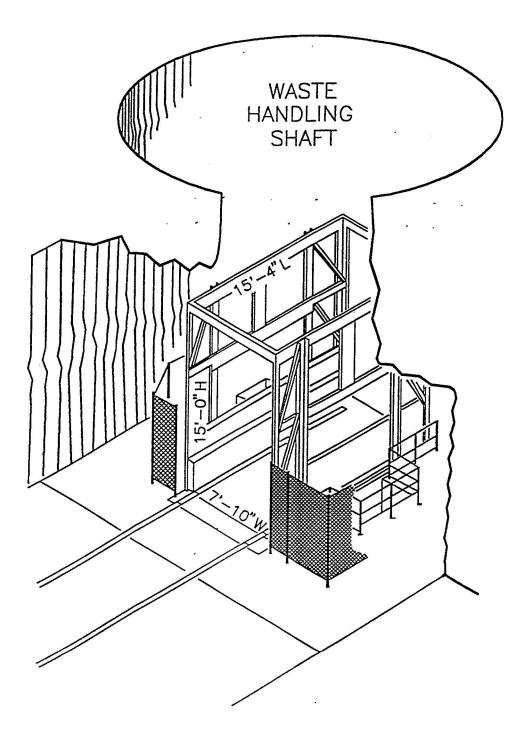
G-2 Waste Handling Shaft Cage Dimensions
